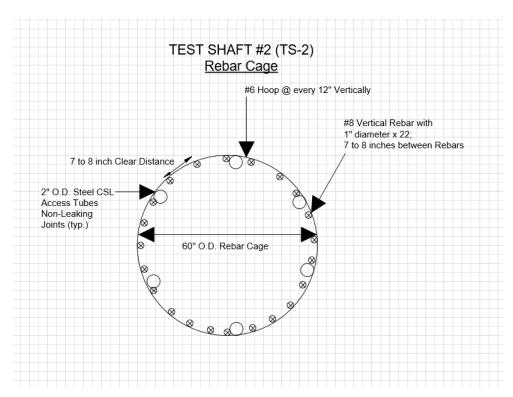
Illustration. Initial design cross section of test drilled shaft #2 with reinforcement detail.
